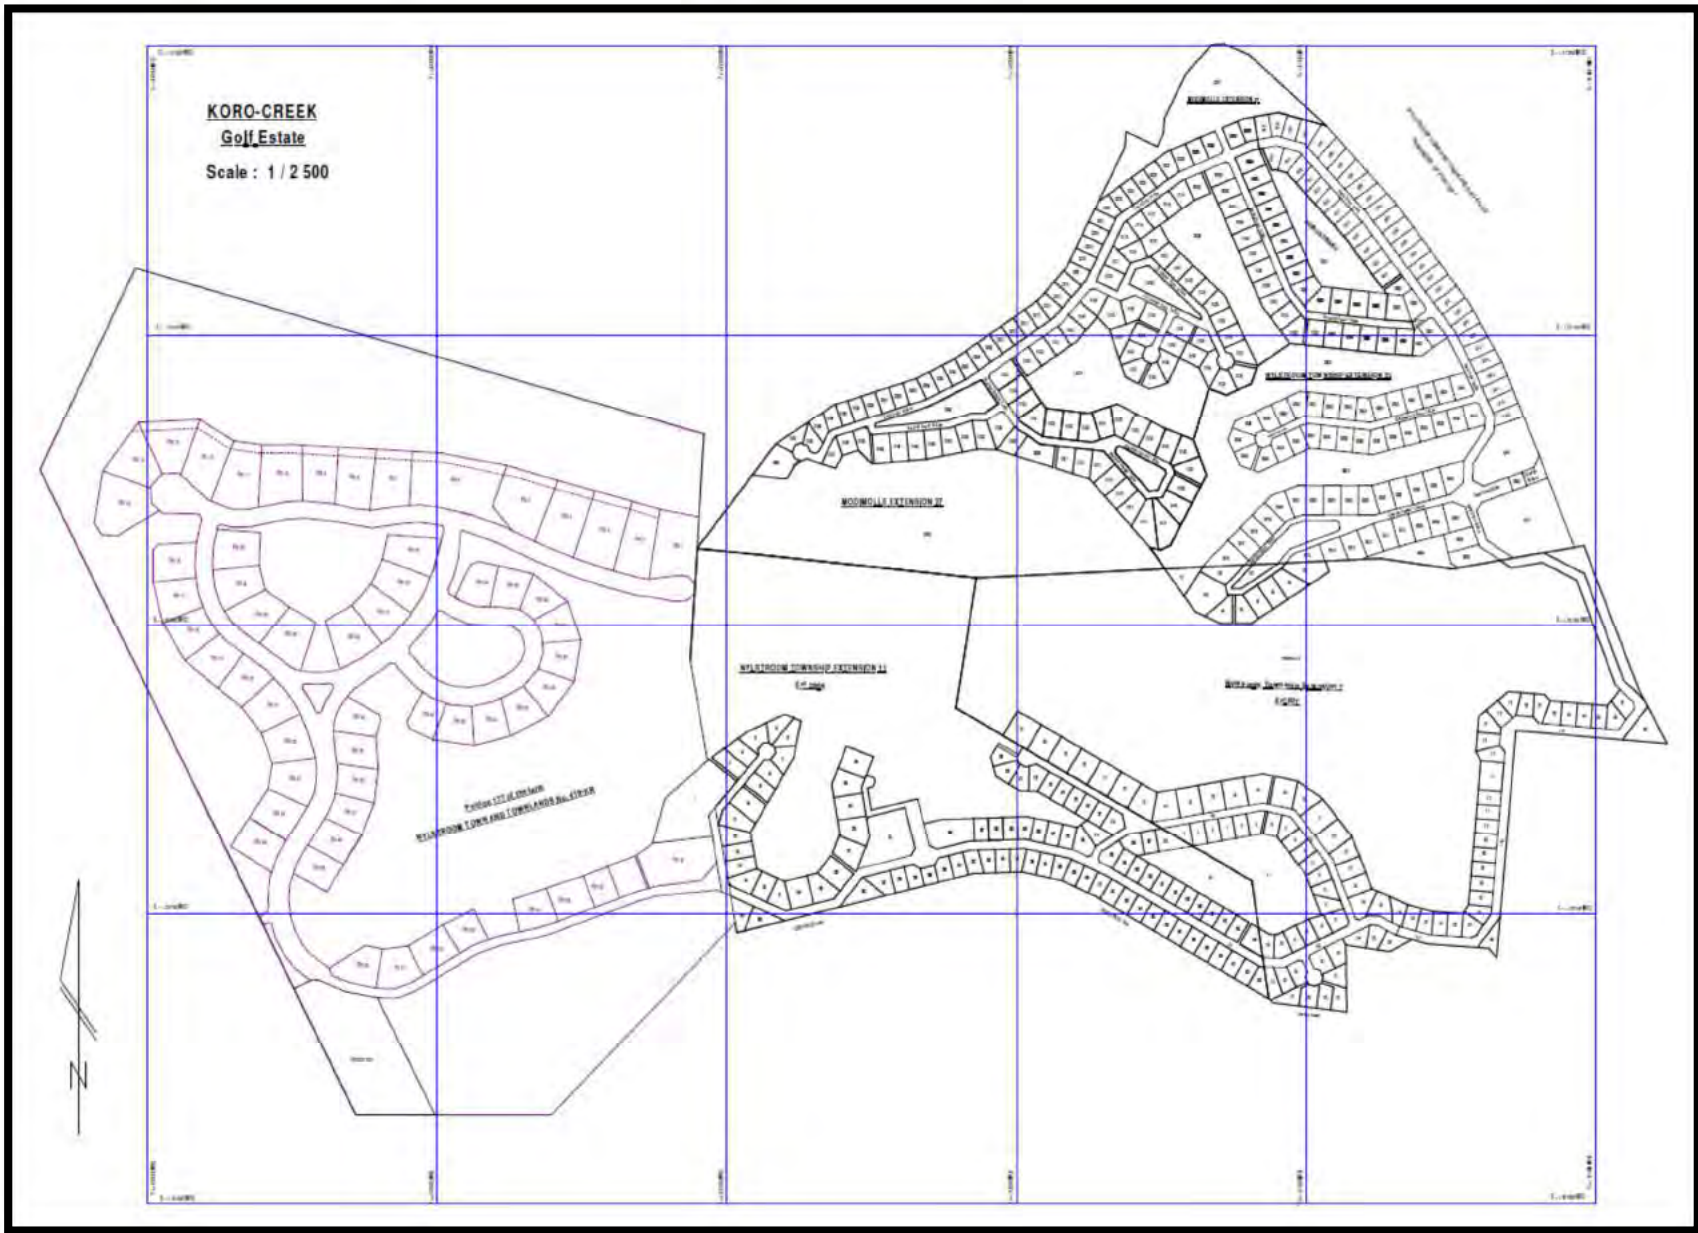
KORO CREEK GOLF ESTATE LAY-OUT PLAN
